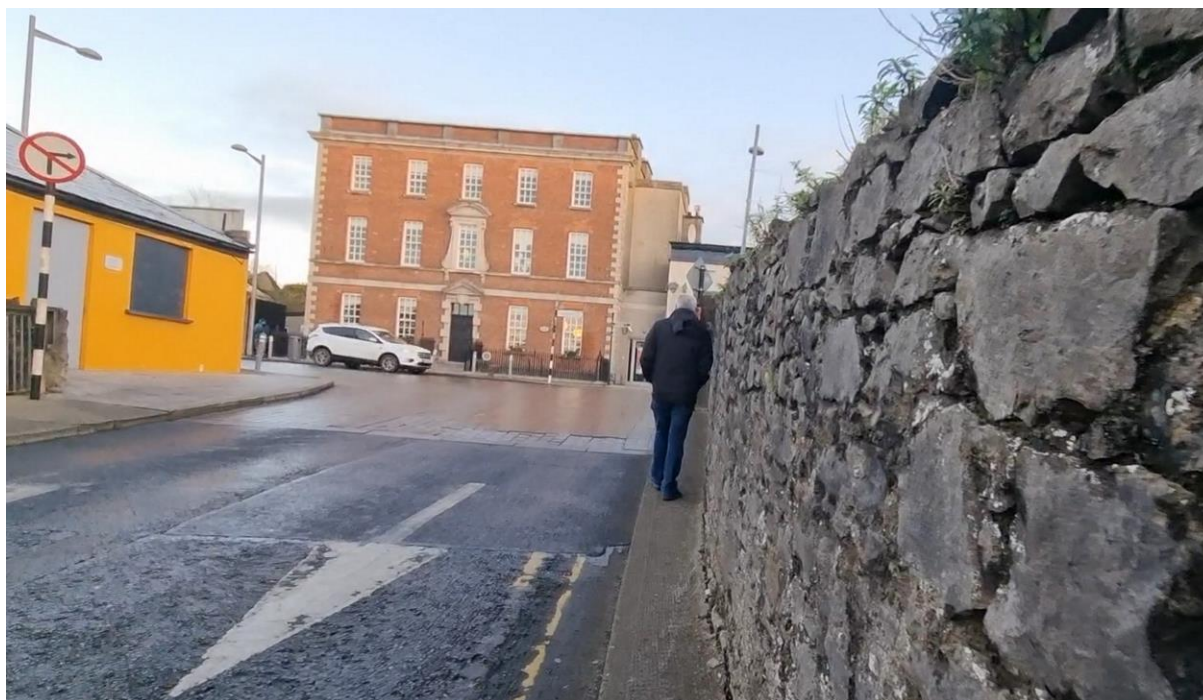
Very Narrow section of footway retained on Father Connolly Way
